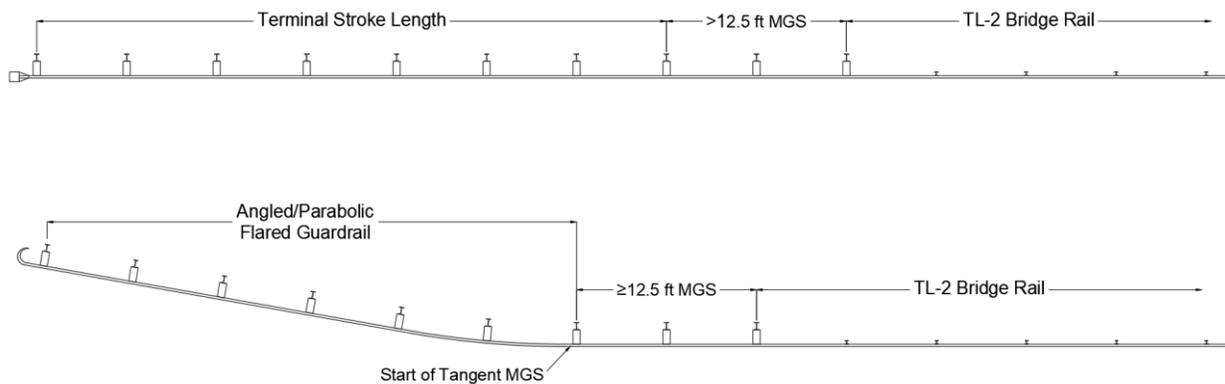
Separation of Manufacturer Specified End Terminal Stroke Length and Bridge Rail
